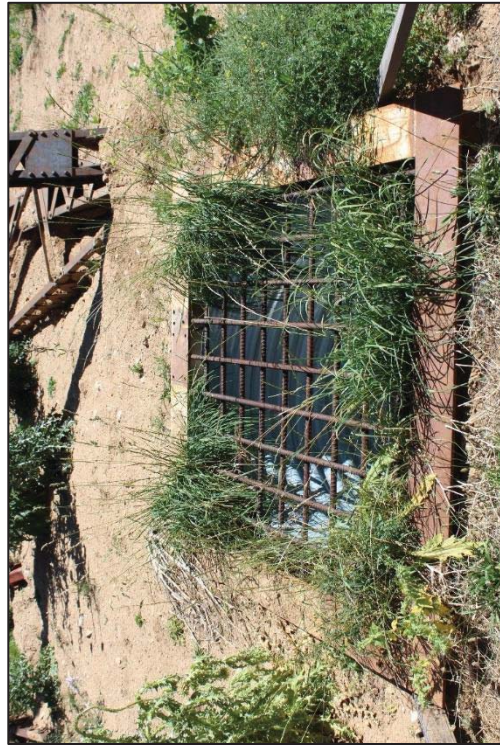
Detail of Daly-West Mine Shaft, facing southeast.
